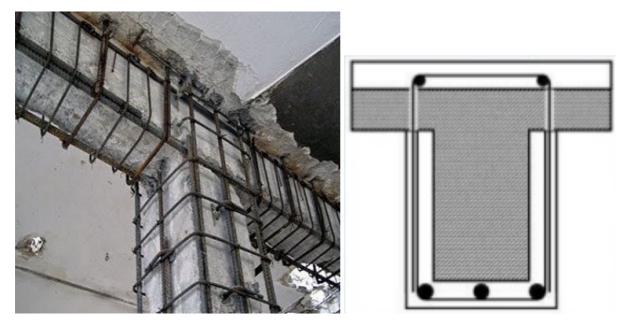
Jacketing of Beam using RCC jacketing (credit: yash construction)
